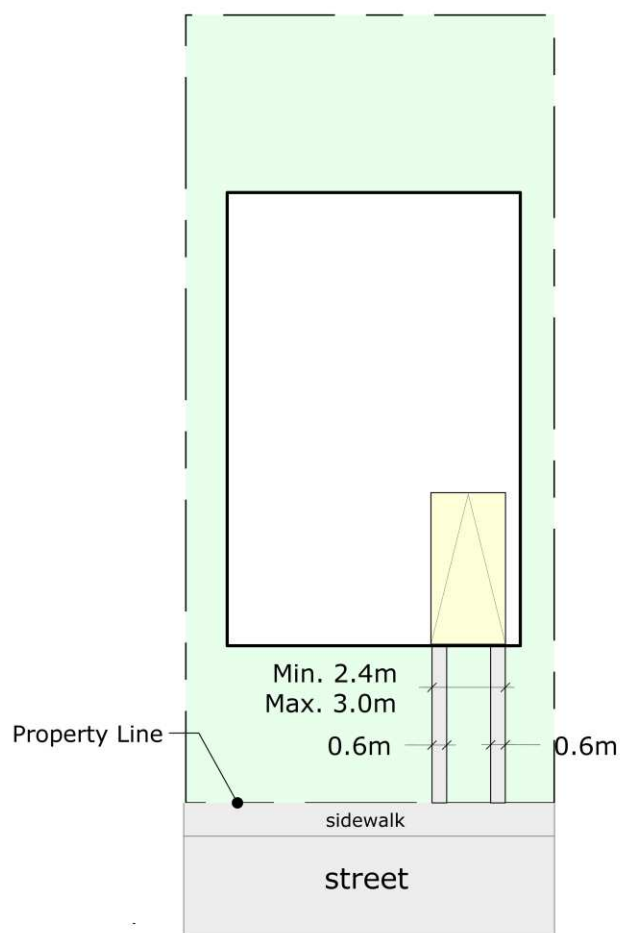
illustrates the maximum wheel strip width and maximum total driveway width of a wheel strip driveway. The space between wheel strips must be comprised of permeable material.
